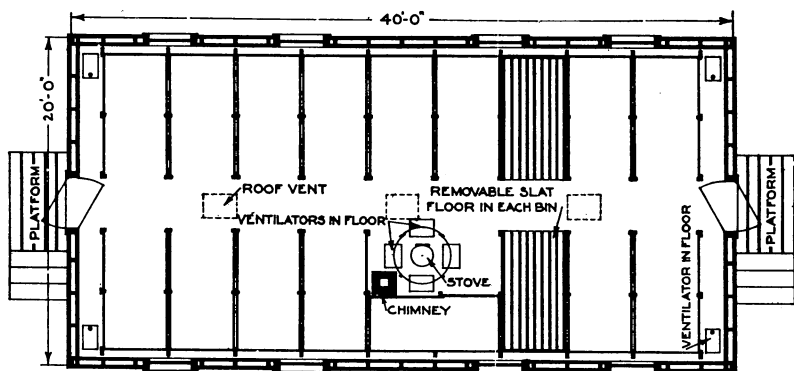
Floor plan of a sweet-potato storage house, size 20 by 40 feet, having a capacity of 2,000 bushels in crates or 2,500 bushels in bulk, showing location of ventilators, stove, arrangement of bins, and other details
